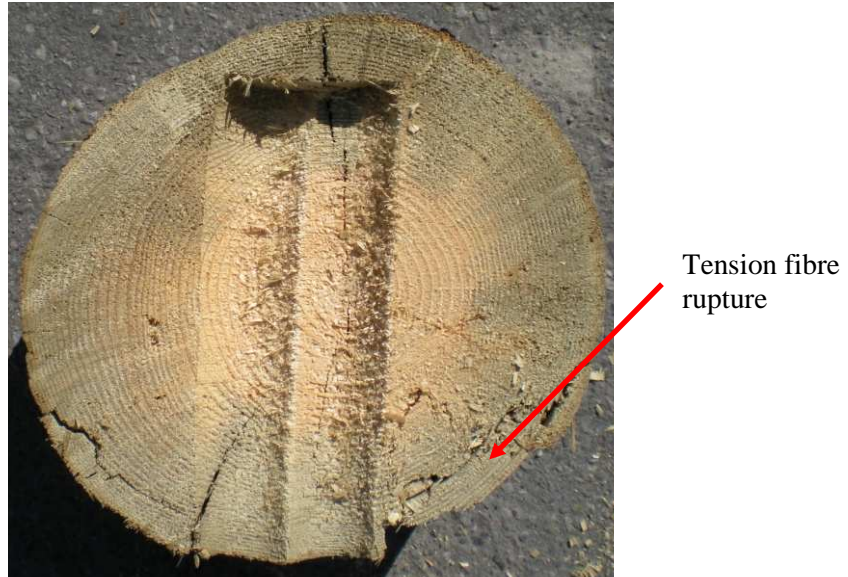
Cross-section of new pole specimen with tension nesting damage (55-1-1).
